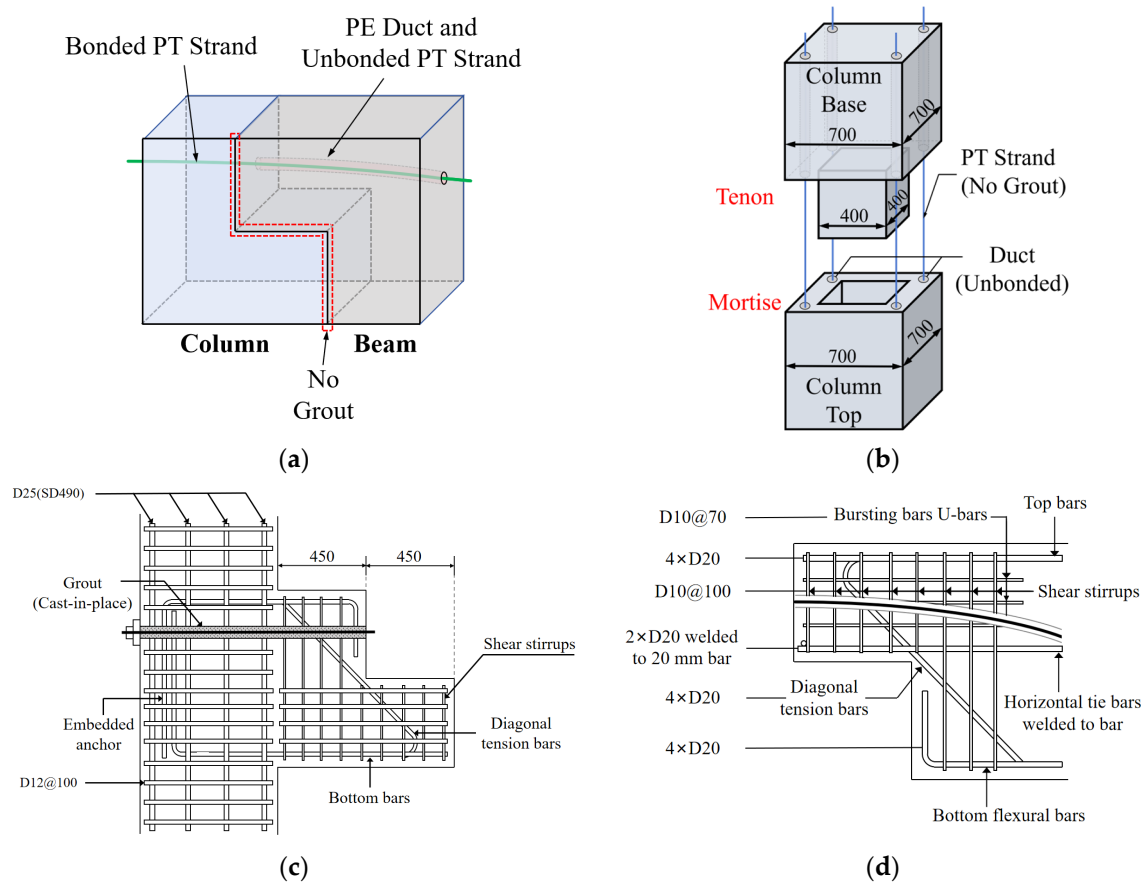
Details of PCaPC frame. (a) Beam-to-column. (b) Column-to-column. (c) Section details of MT column. (d) Section details of MT beam.
